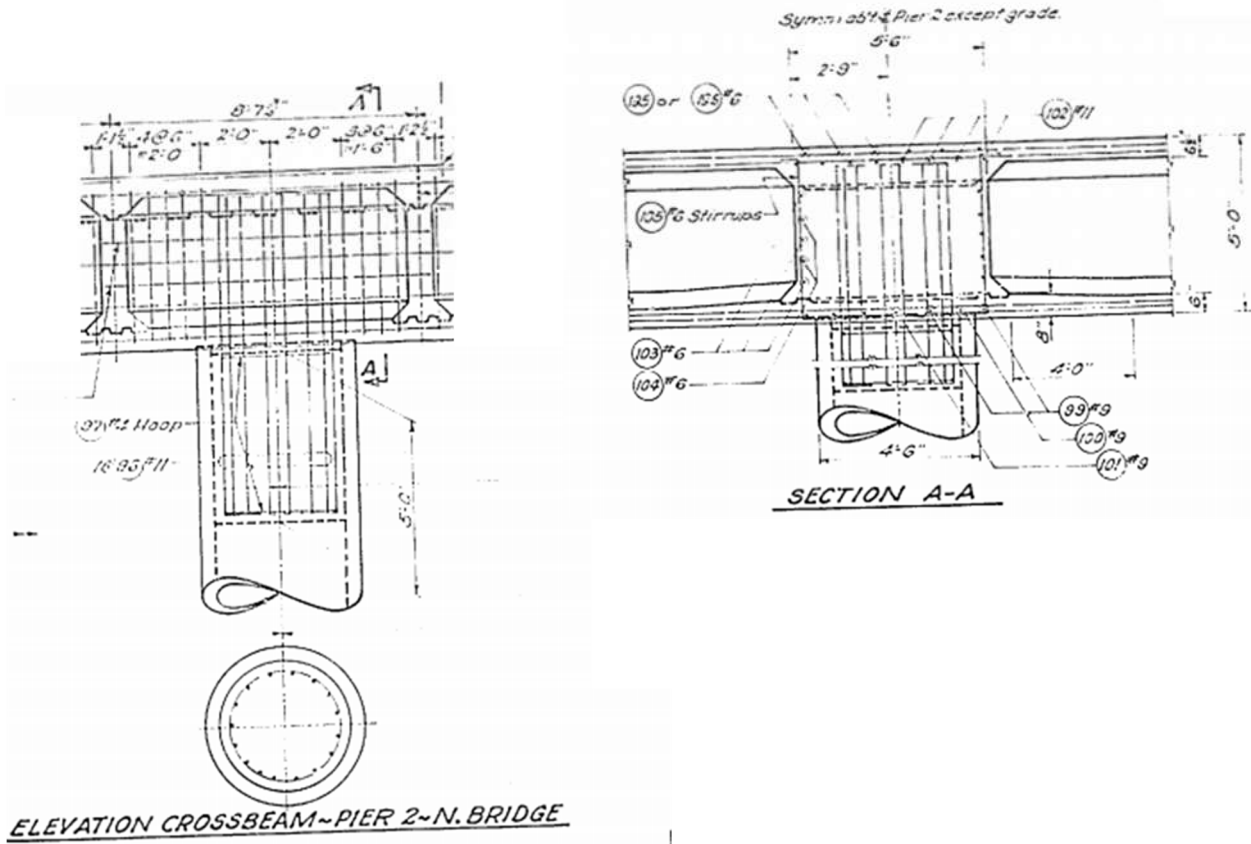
Details of Inner Plug Reinforcement (Green River)
